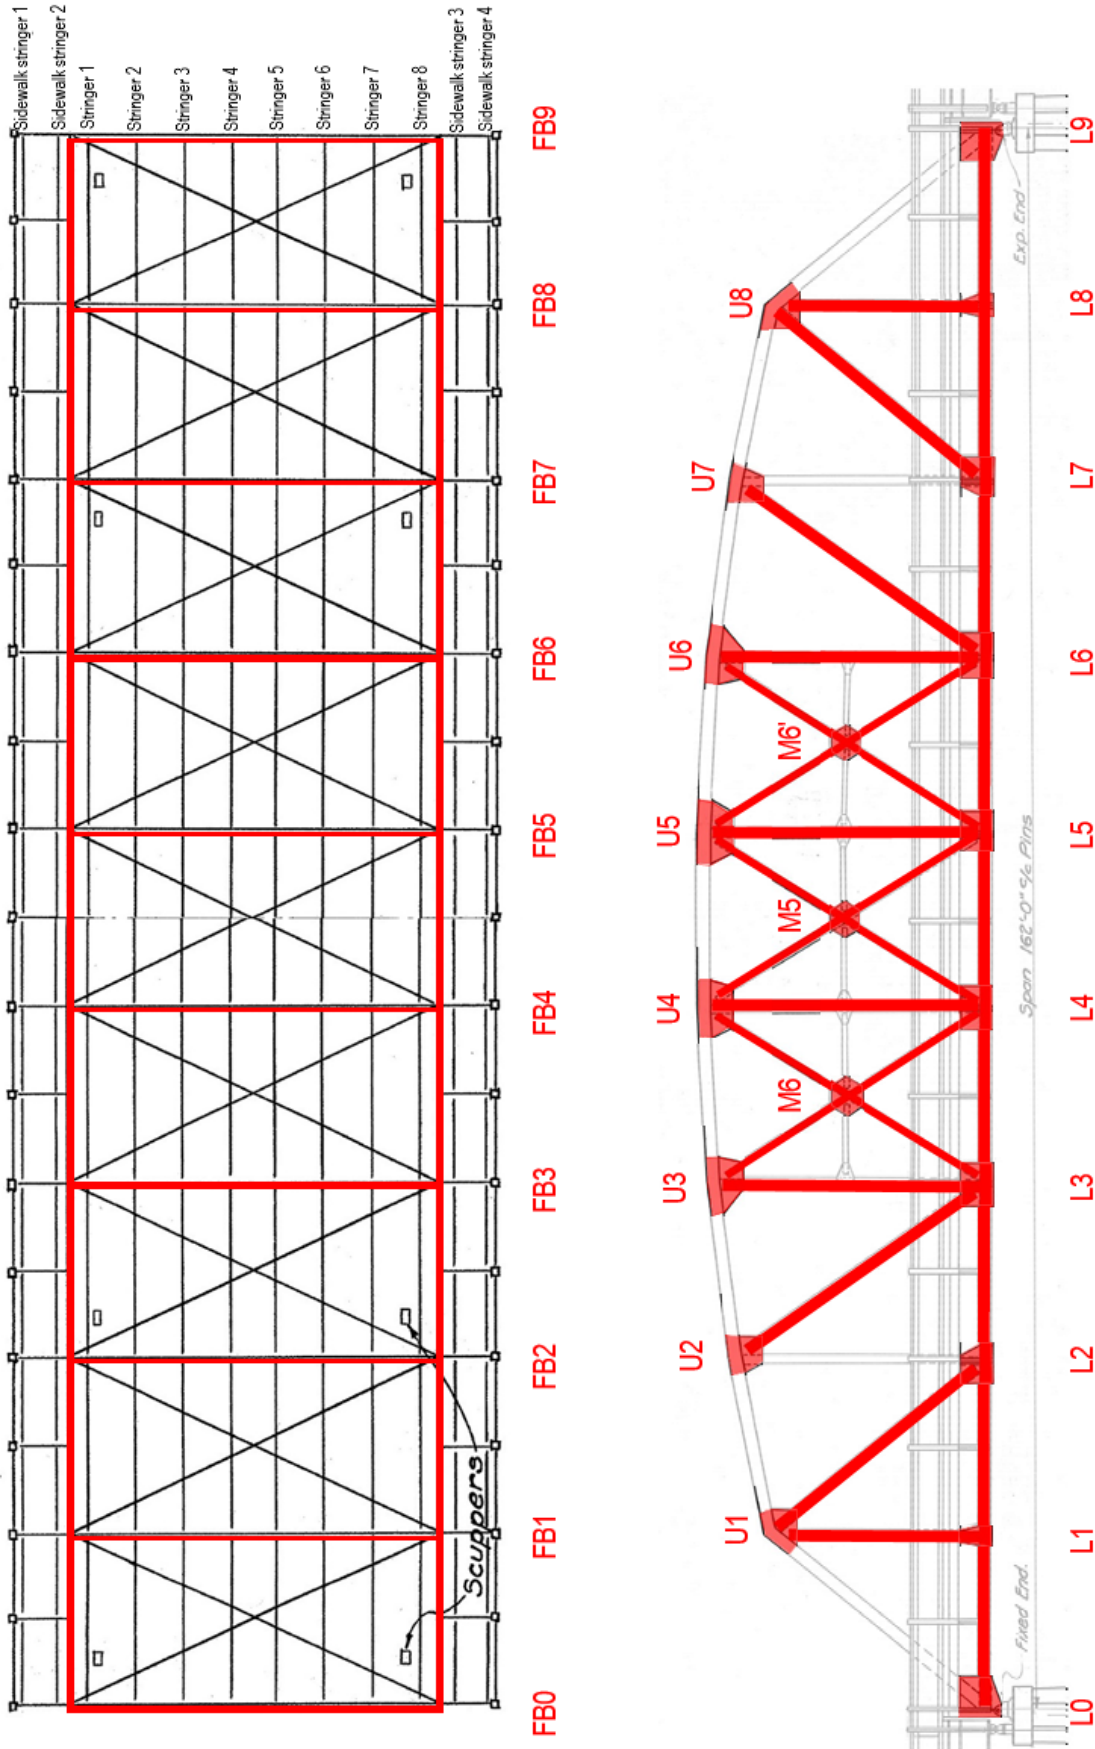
Span 2 framing plan and truss south elevation (Images taken from the 1932 design drawings).
